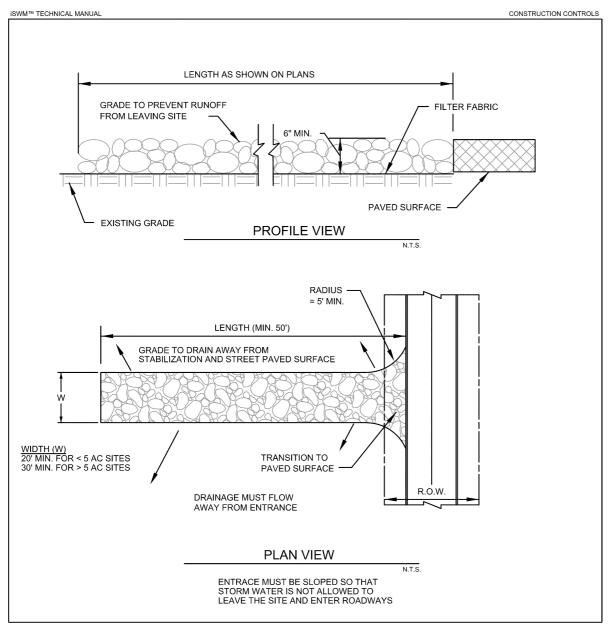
STANDARD CONSTRUCTION DETAIL - STABILIZED CONSTRUCTION EXIT (1 OF 2)
